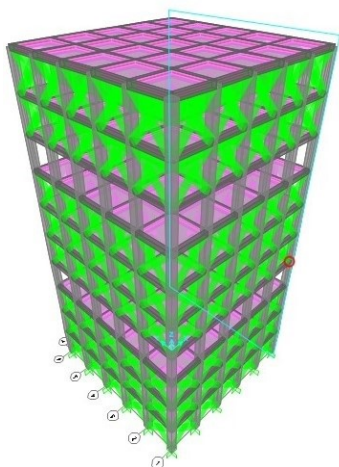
3D view of AAC block infilled building with soft storey at 4th and 8th floor building.
